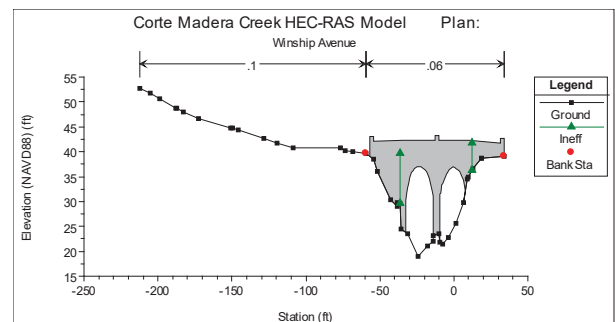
HEC-RAS Cross Section at Winship Avenue Bridge
